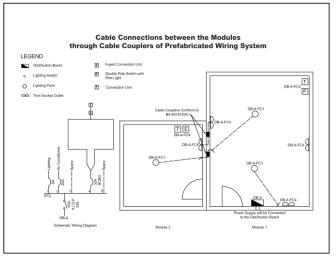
Typical Diagram of Cable Connections between the Modules through Cable Couplers of Prefabricated Wiring System
